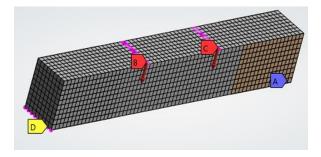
Loading on beam with 400mm CFRP U-wrap
